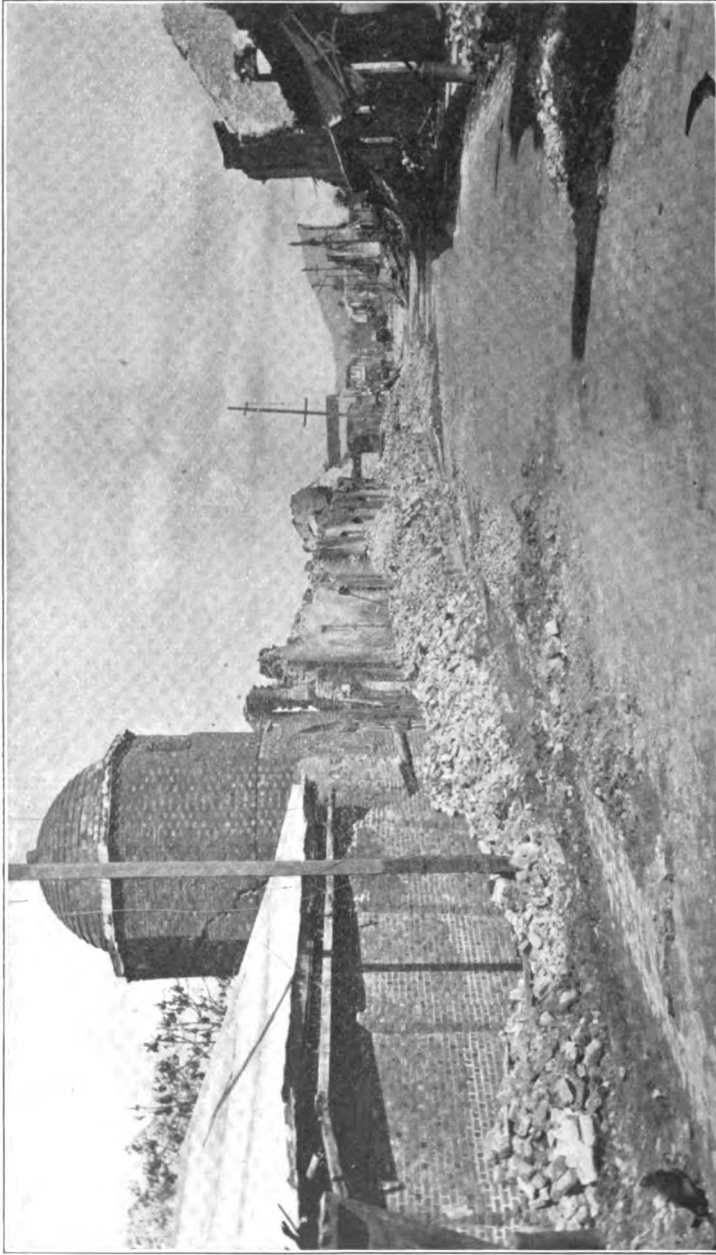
STREET IN BUSINESS SECTION LOOKING NORTH. Western sidewalks covered with debris. Crack in fireproof, octagon building, showing angle of emergence of waves.
